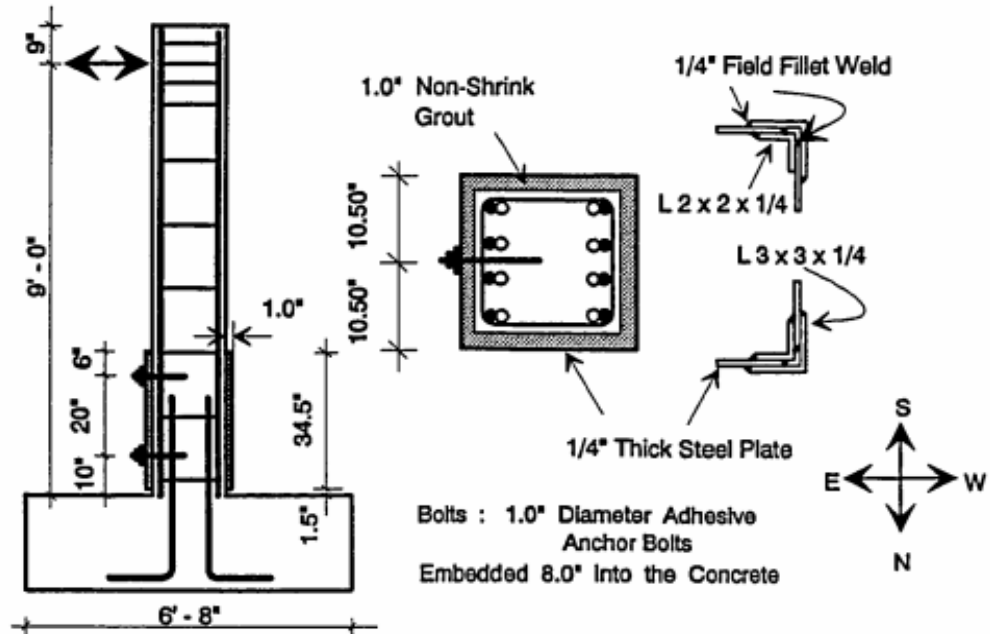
Cross Section of the FC-17 with details of the steel jacket (Aboutaha, 1994)
